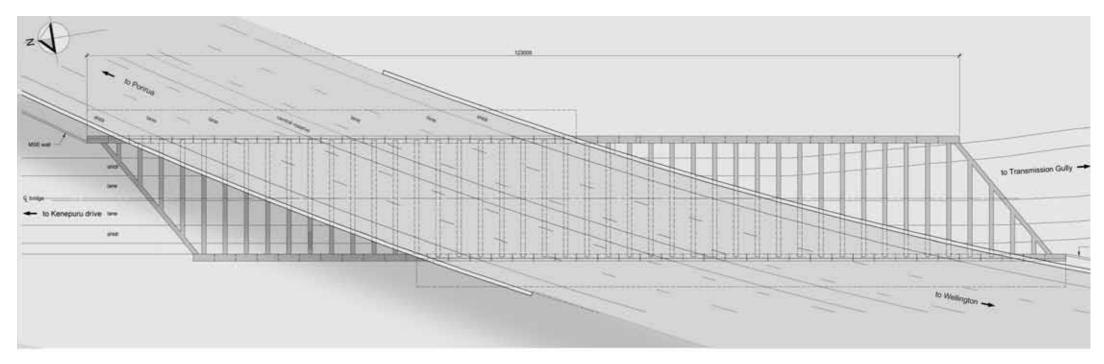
Bridge 27 Kenepuru Link Road underpass - Plan view
